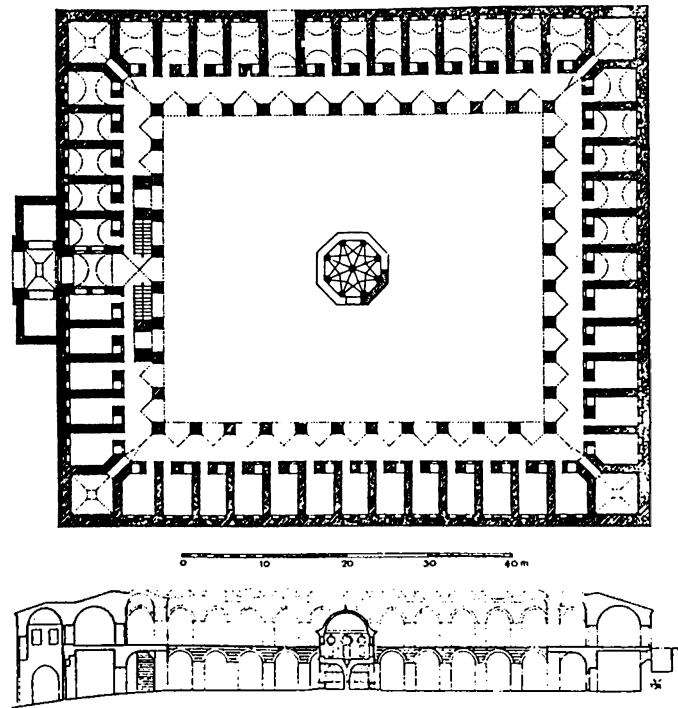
Ground floor plan and transverse (longitudinal) section of the Bursa Koza Han (Cezar, 1983: 61)
